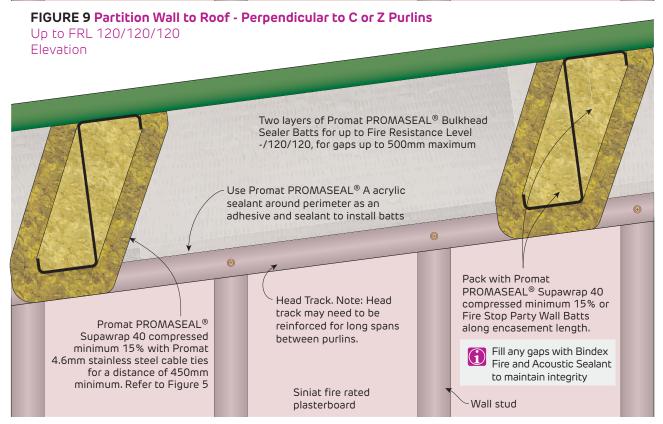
Partition Wall to Roof - Perpendicular to C or Z Purlins Up to FRL 120/120/120 Elevation
